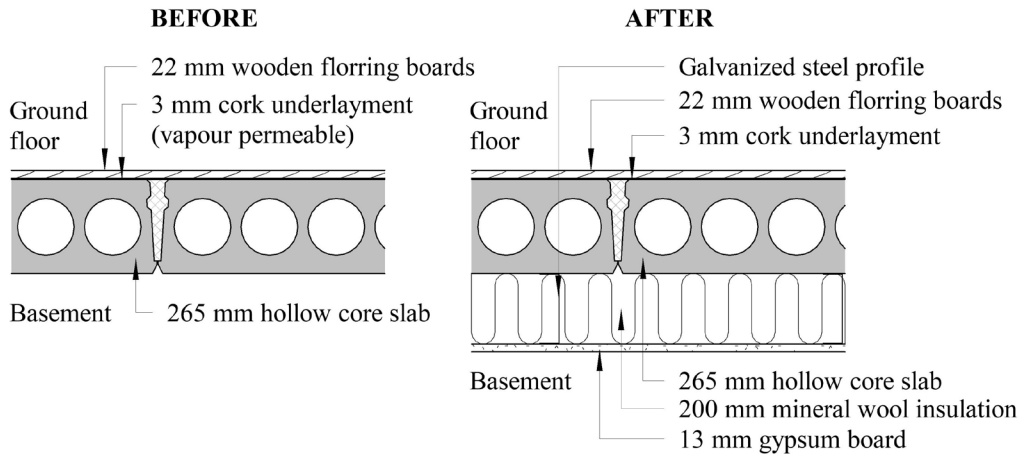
Cross-section view, floor construction towards basement, initial and retrofitted state.
